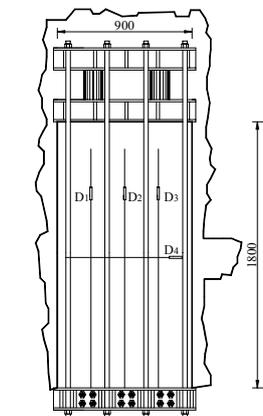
Compression test layout with position of the inductive transducers (dimensions in mm)
